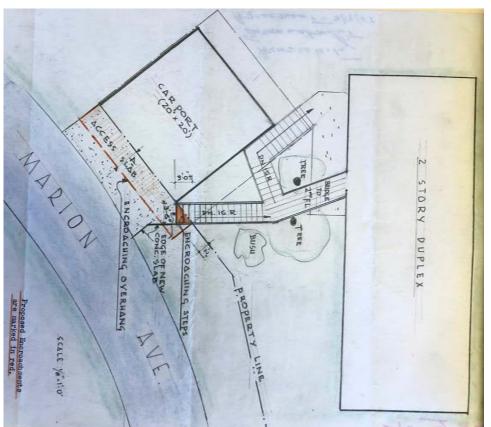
40-42 Marion Ave., Site Plan (from 1958 encroachment permit)
